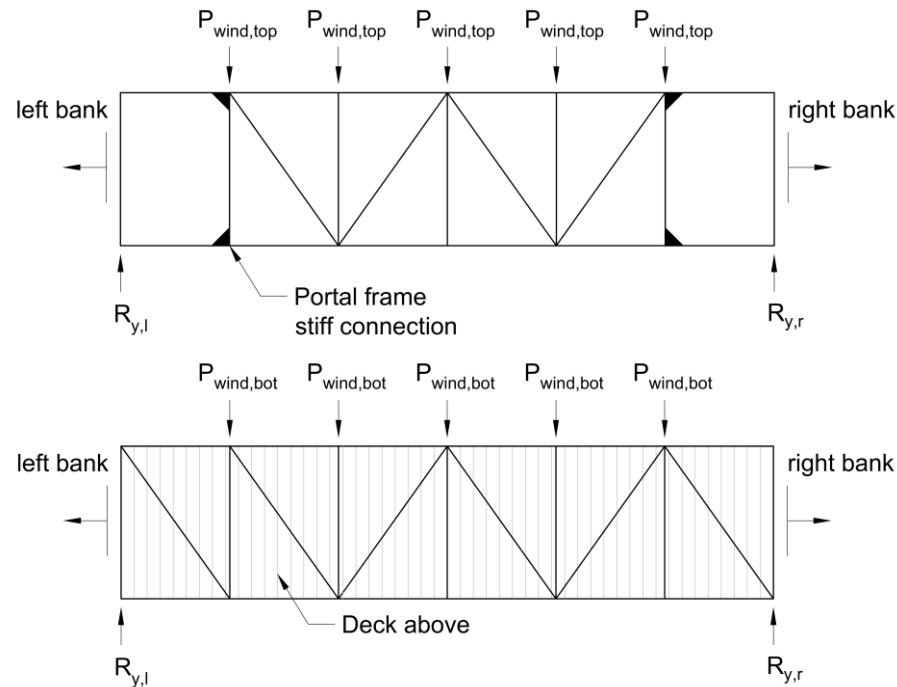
Arrangement of cross bracing on the top (above) and bottom (below) of a truss bridge. The bridge has the same geometry as the one analyzed in Lecture 13.
